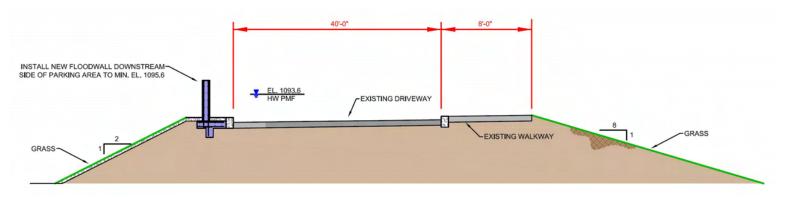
Cherokee Dam – Concrete Floodwall Concept for All Segments
